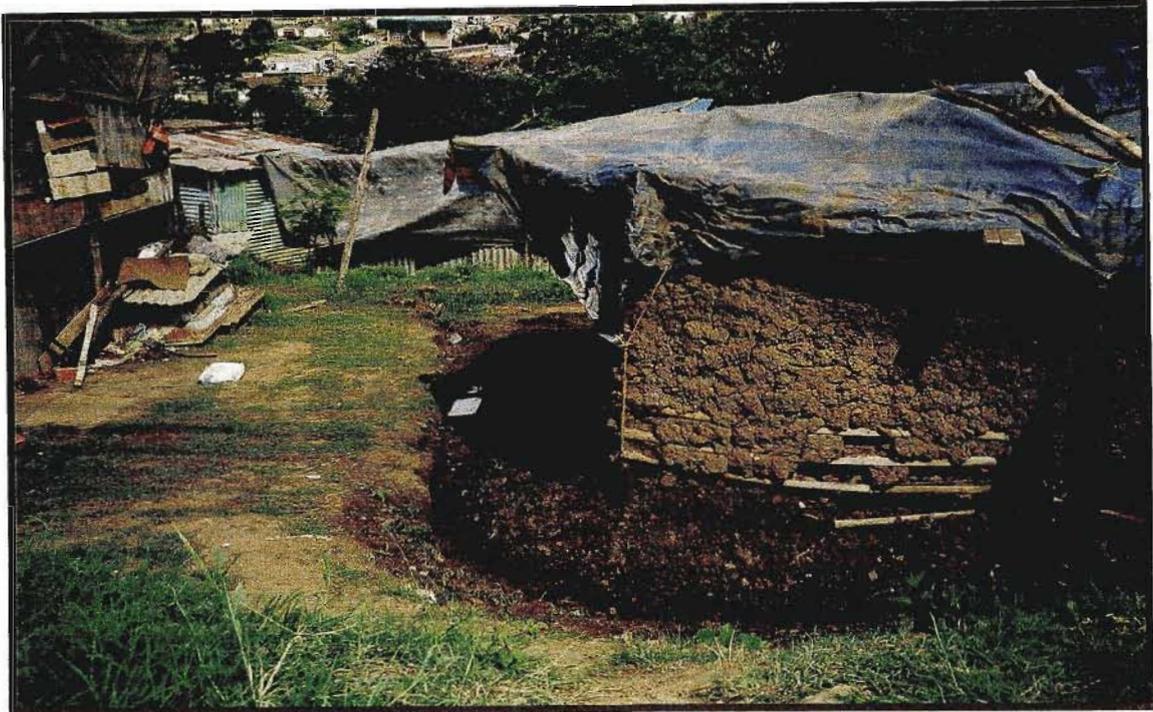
An informal dwelling in Cato Crest showing water damage and an attempt to prevent further damage by constructing a ditch around the house. (Source: Thomas, 2001)
